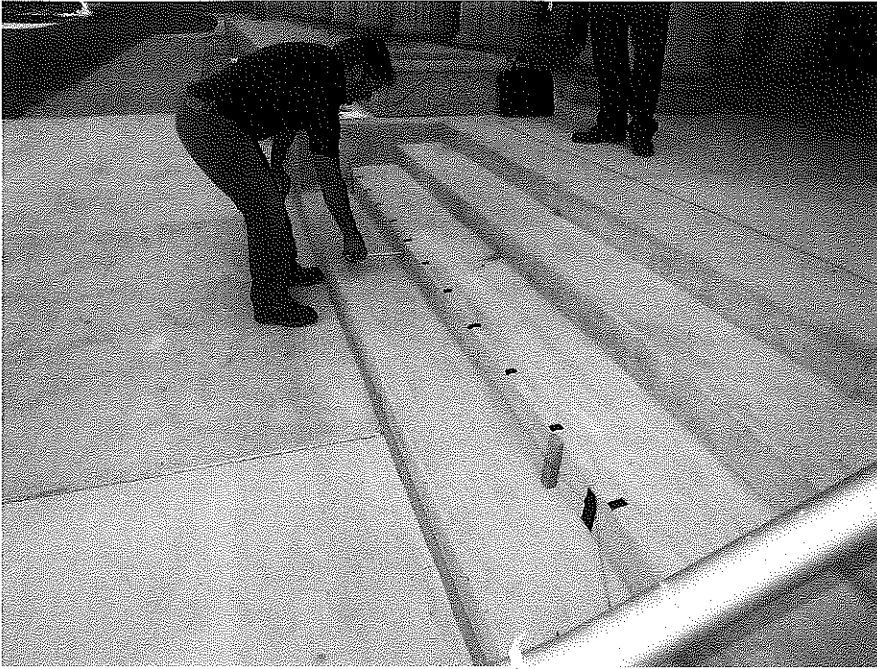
Overall photo at north section Stairway A, measurements of second riser
